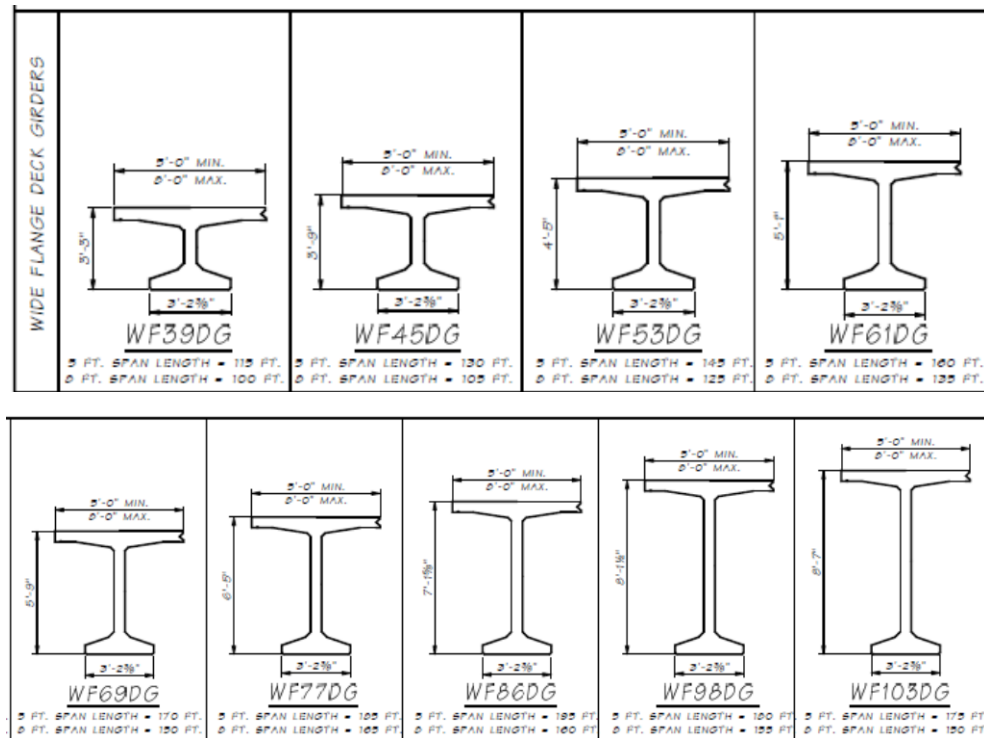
WFxxDG Wide Flange Deck Girders Requiring Concrete or HMA Overlay
